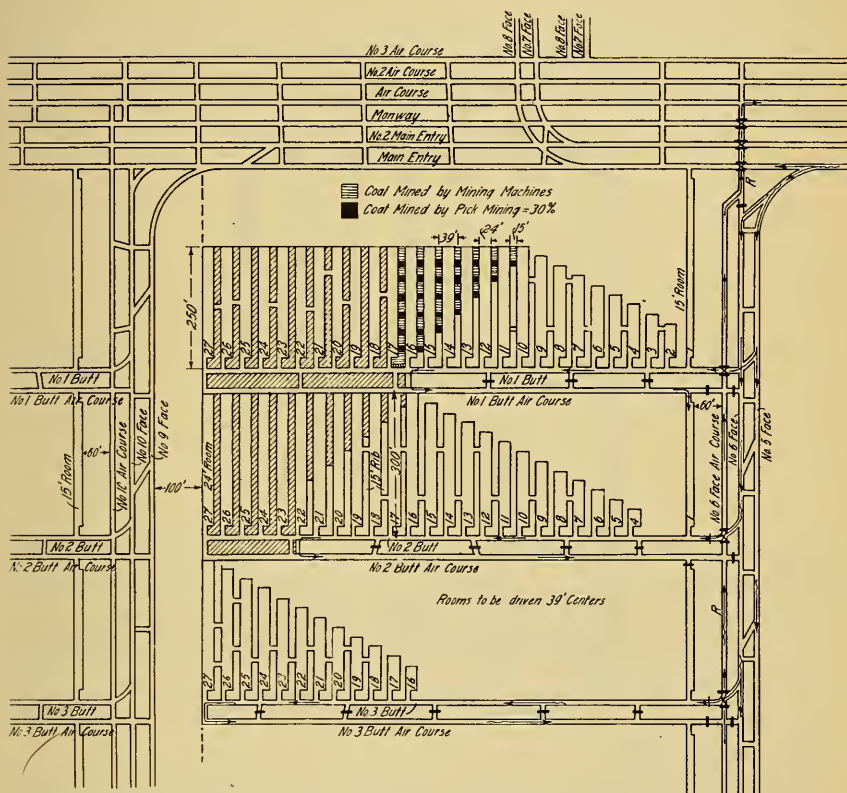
PILLAR DRAWING WITH MACHINES IN PITTSBURGH, PA., DISTRICT
